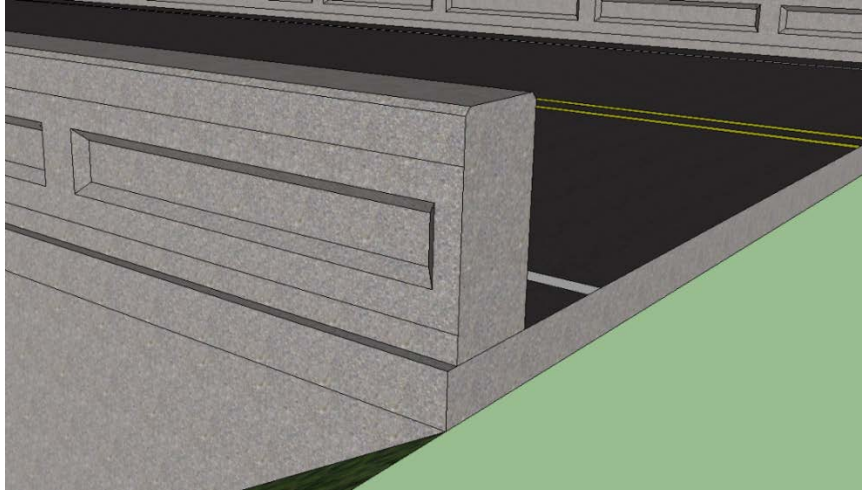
Elevation view of the retrofit Bush-Hammered Panel railing
